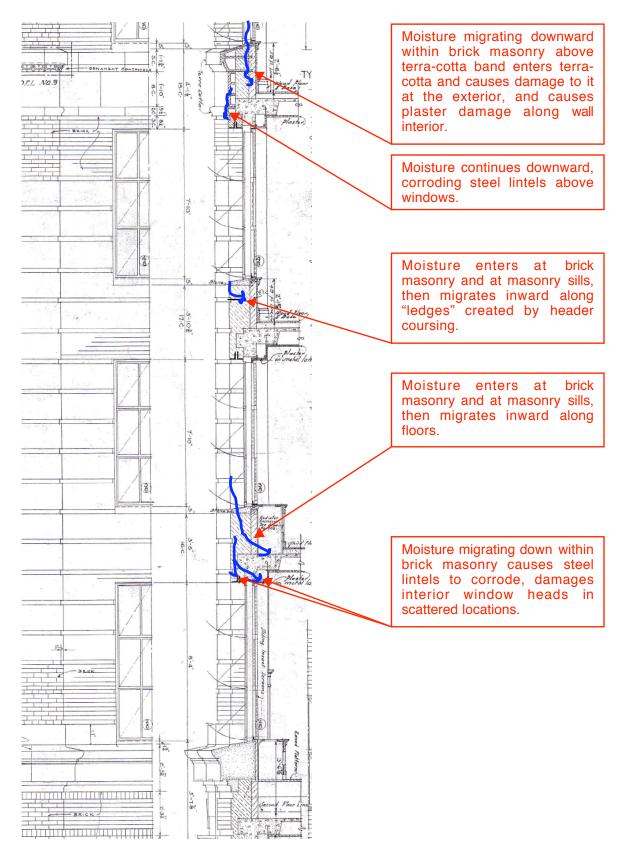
Infiltration Pathways Via Exterior Masonry Walls
